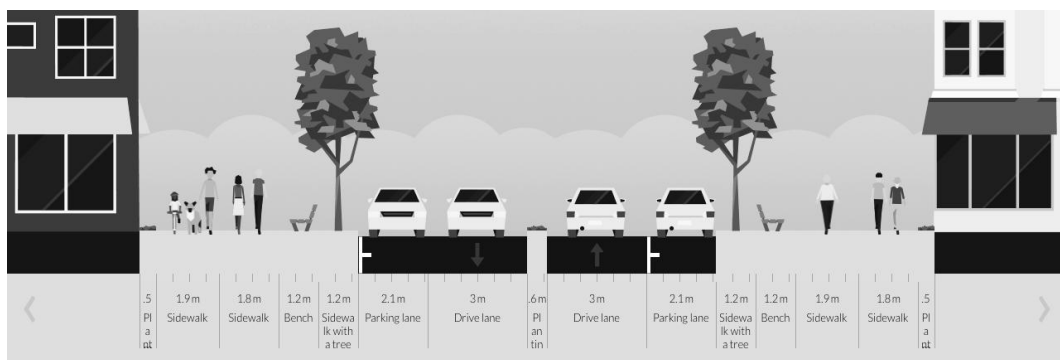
Street width: 24 m. Street consisting of wide sidewalks, space for greenery, drive lanes and parking lanes. Designed with streetmix.net.
